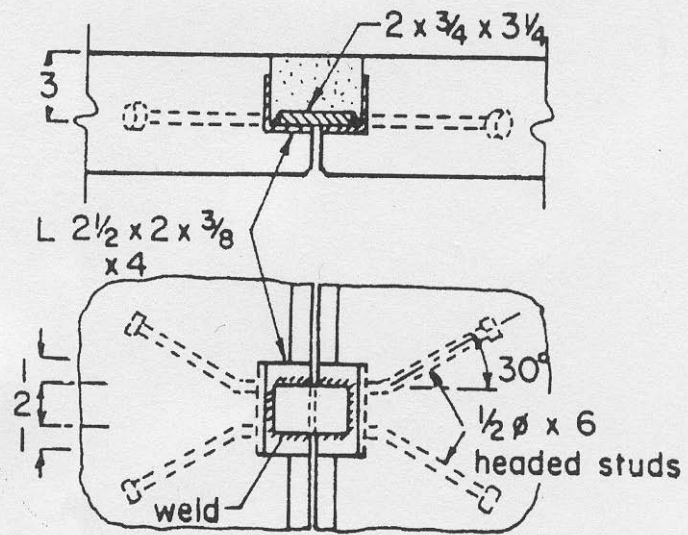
Typical Connection Detail Used by Concrete Technology Corporation
